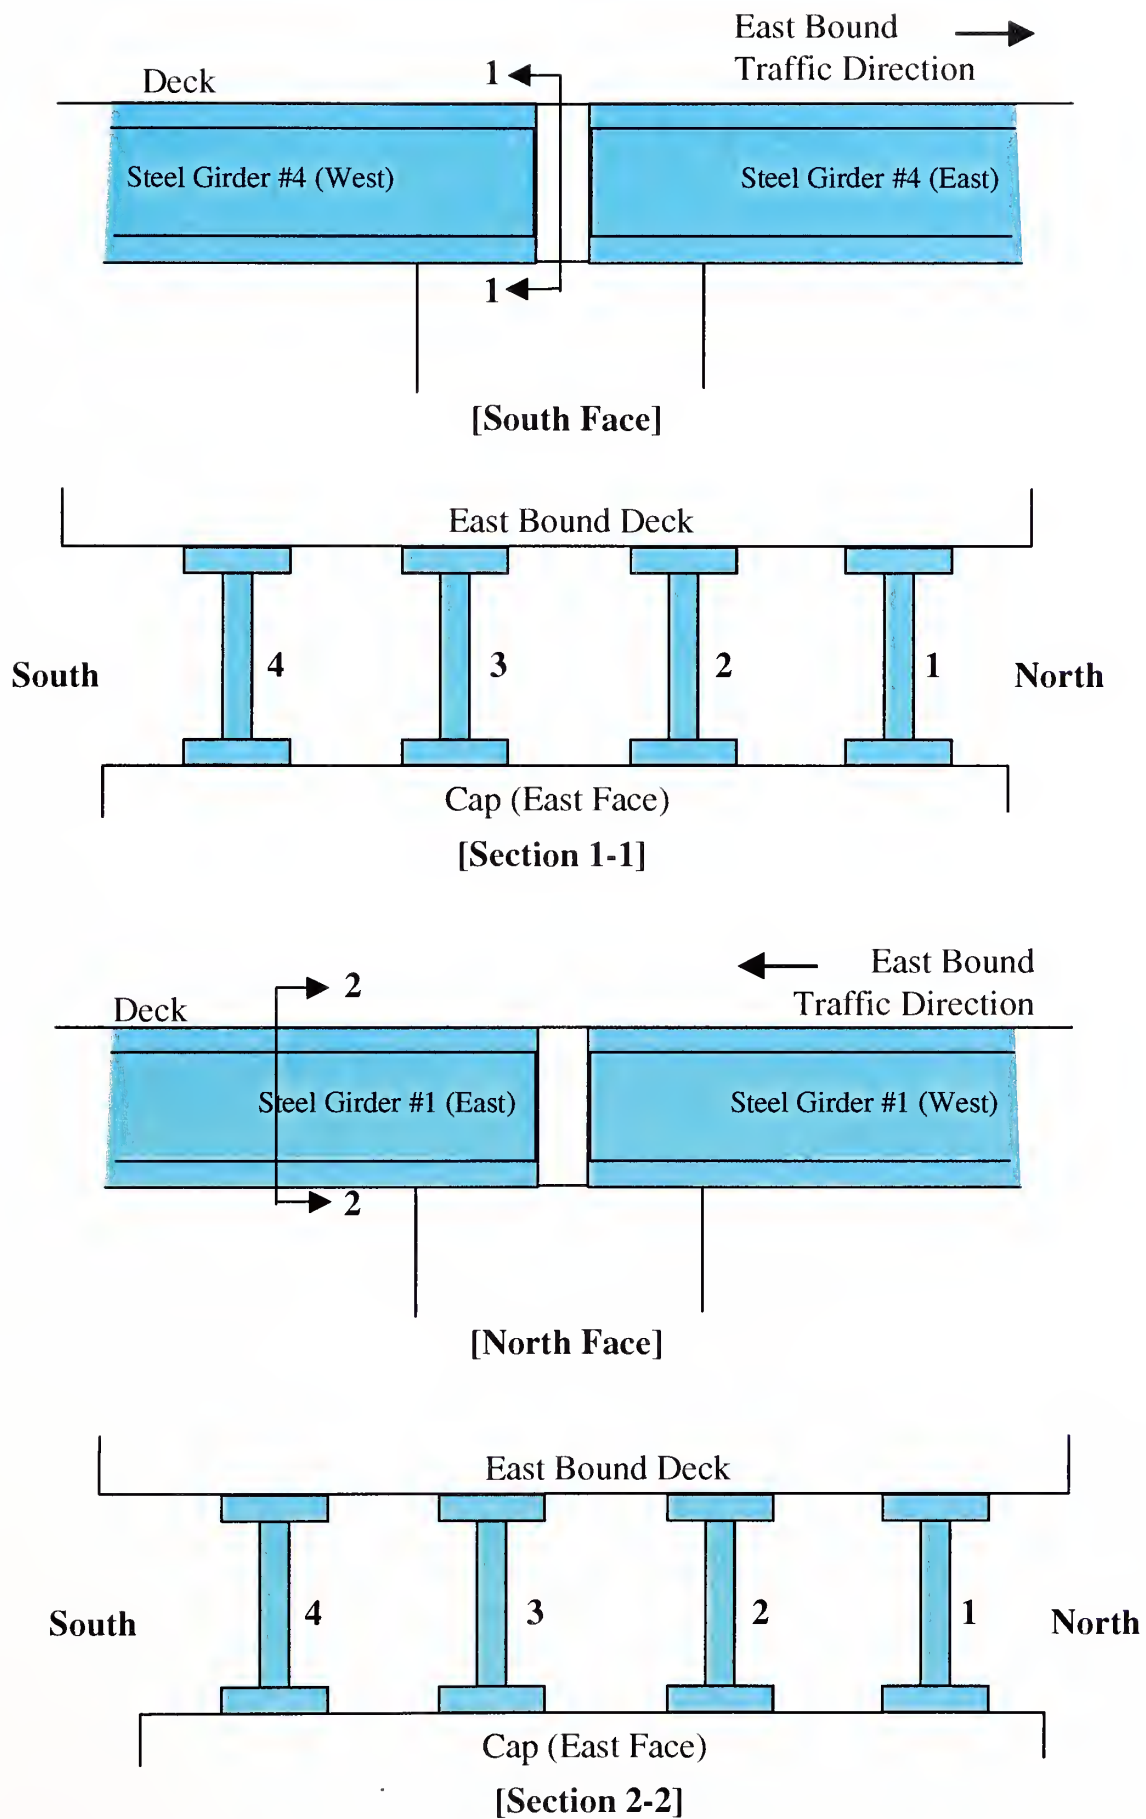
B. Condition of Girder Joints over Bent No. 13 (East Bound).
